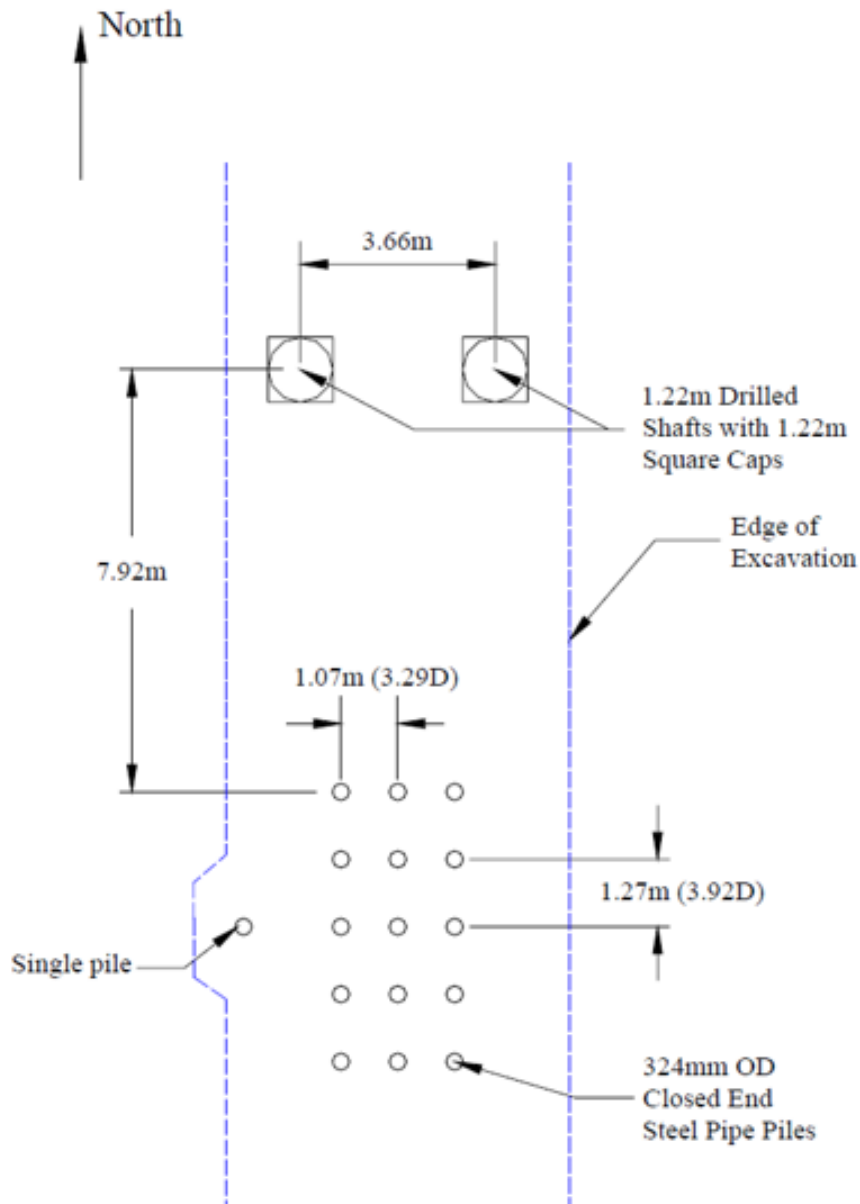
Topview pile plan Salt Lake City case (Snyder, 2004)
